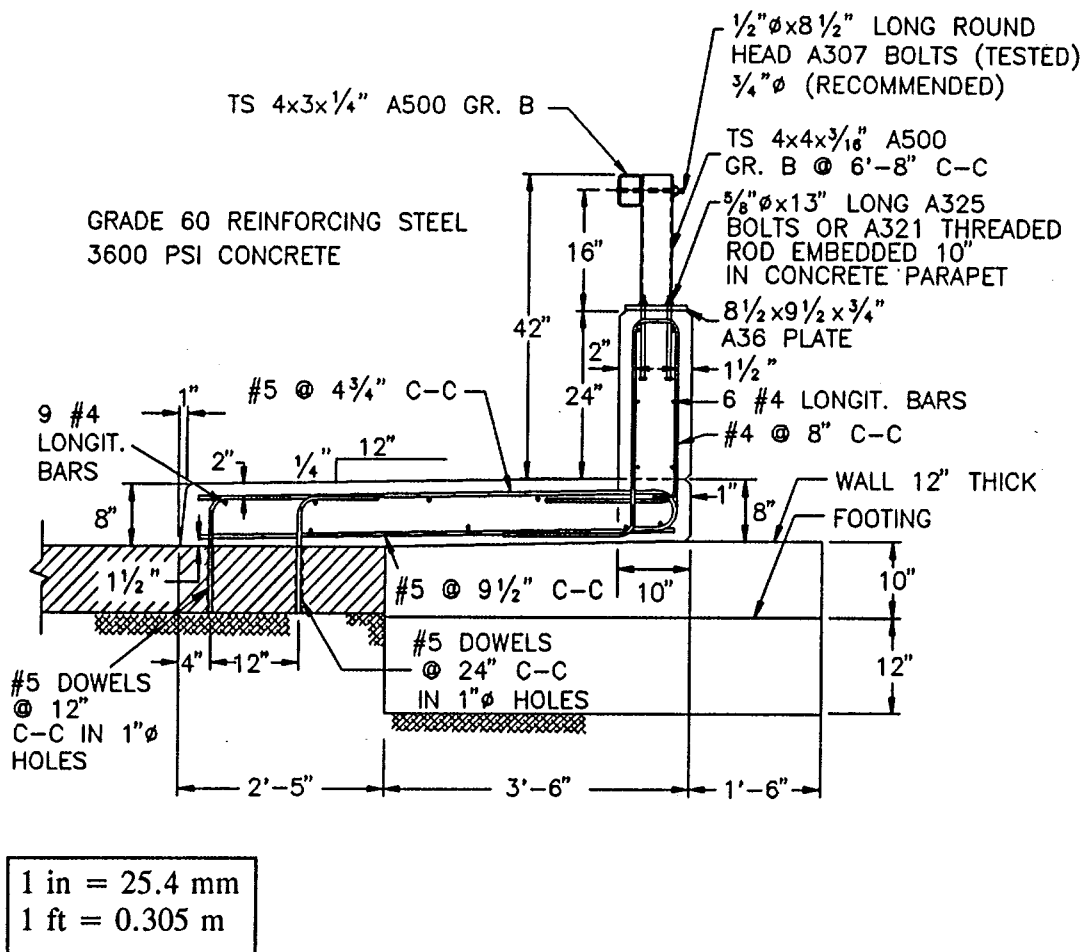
BR27C Bridge Railing with Sidewalk (8,40,42).
